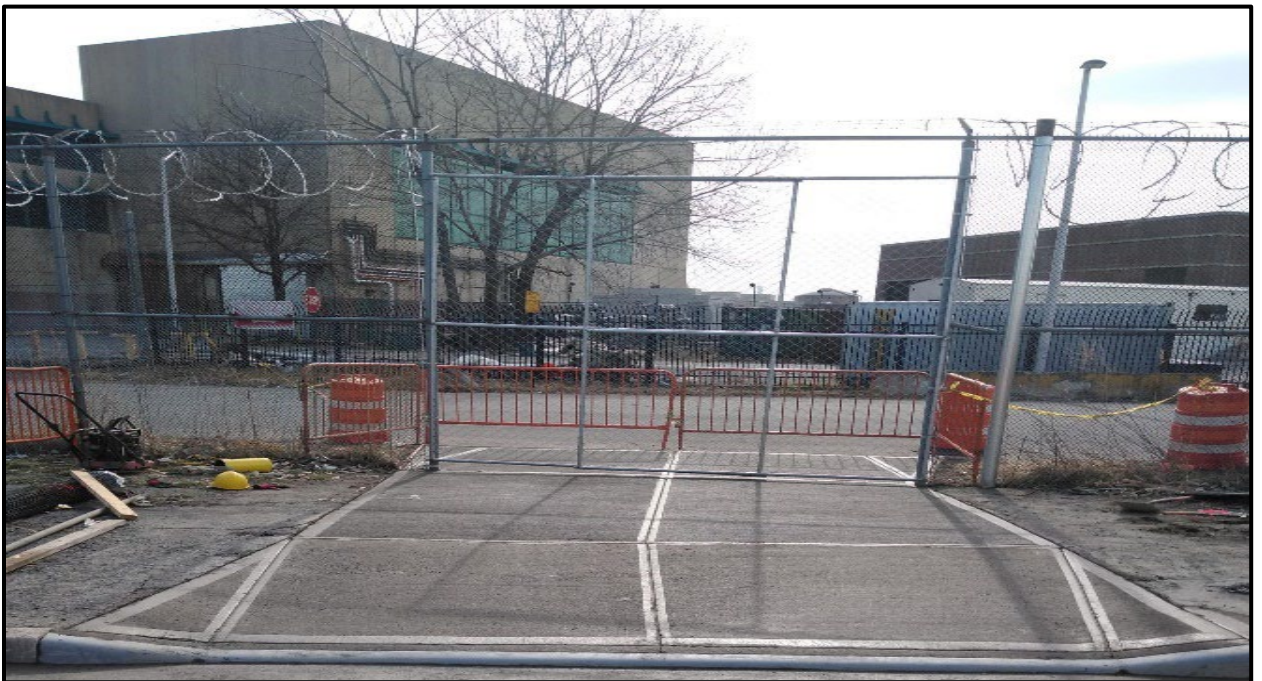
Facing west in the northwestern portion of Site; newly completed entryway in the western portion of Site installed by Verdugos General Contractors Corp. (March 2019).
